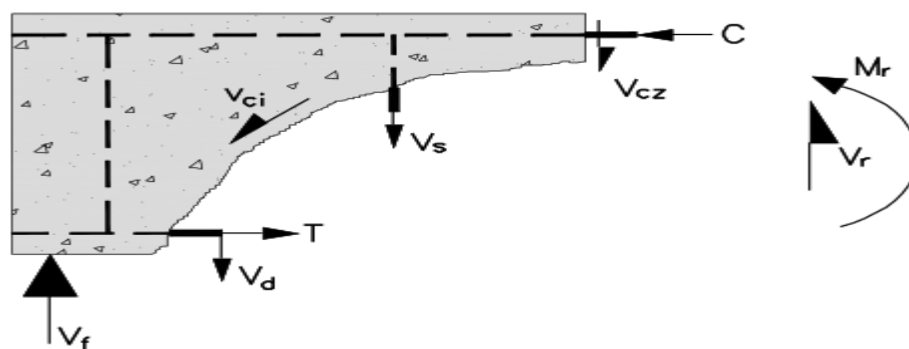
Shear transfer in reinforced concrete beam, taken from Phillip, T., 2016
